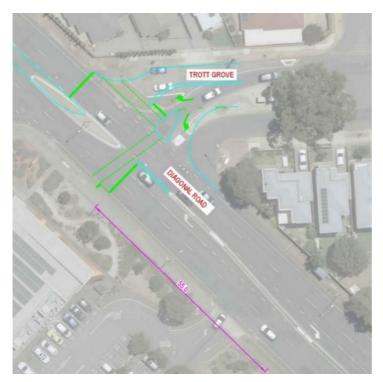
Sketch plan of a signal at the Trott Grove/Diagonal Road intersection
